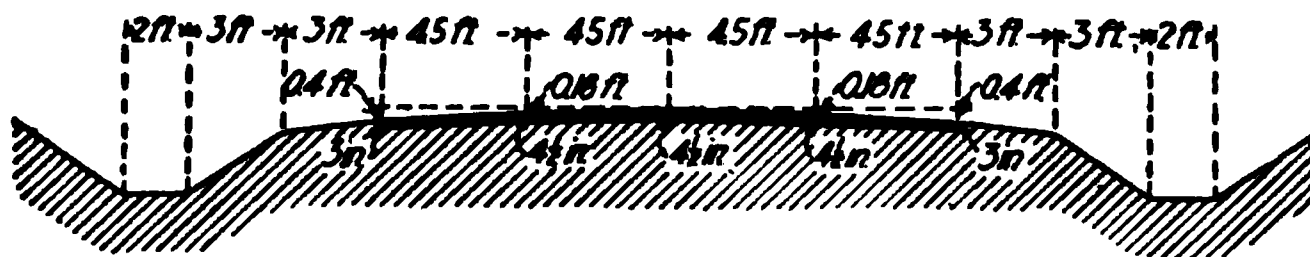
GENERAL SECTION OF FLUSHING AND JAMAICA ROAD.
